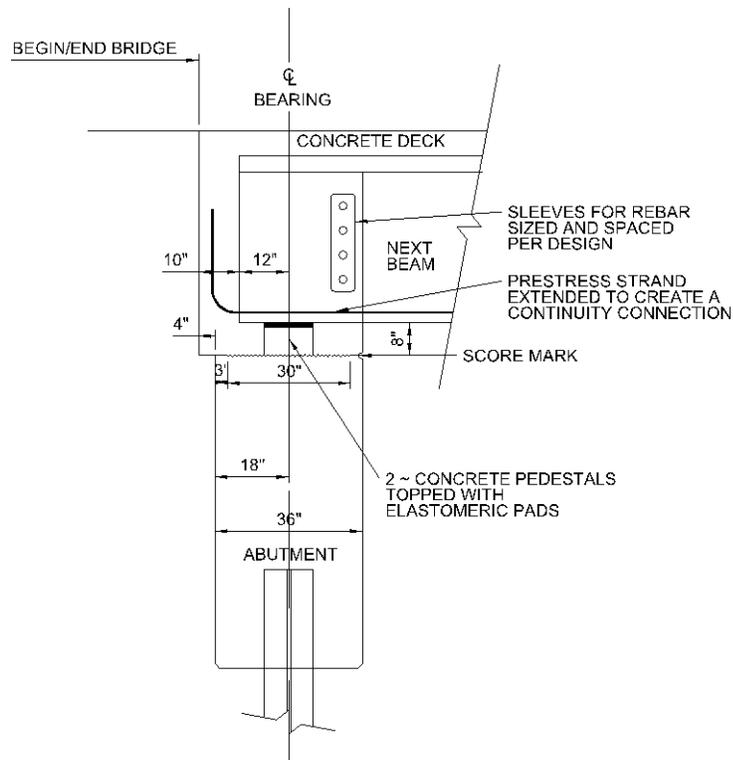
3 North East Extreme Tee (NEXT) Type B Bridge End Detail
